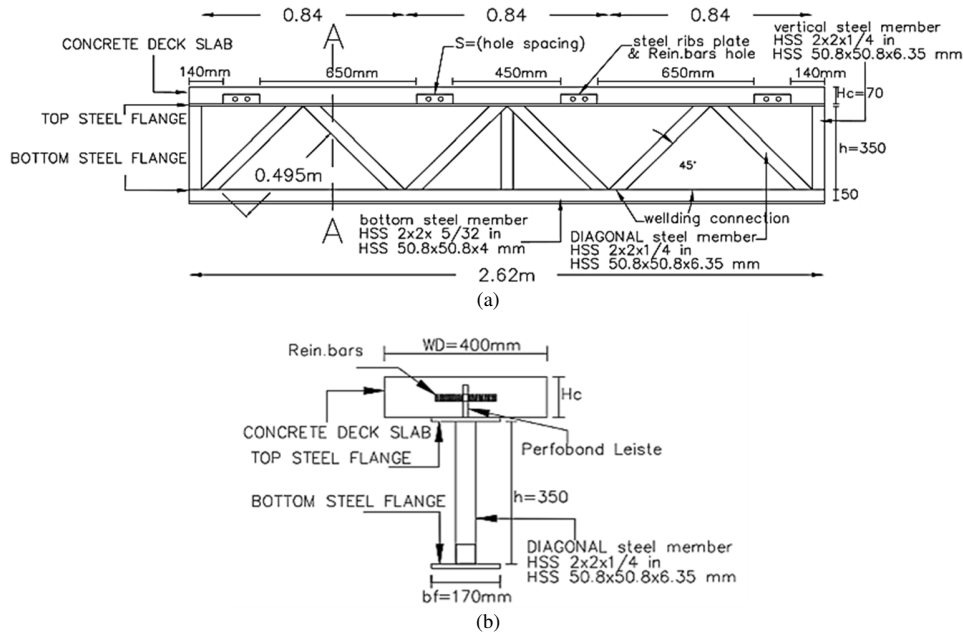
SCTG models. (a) Layout of specimen, (b) section view (A-A).
